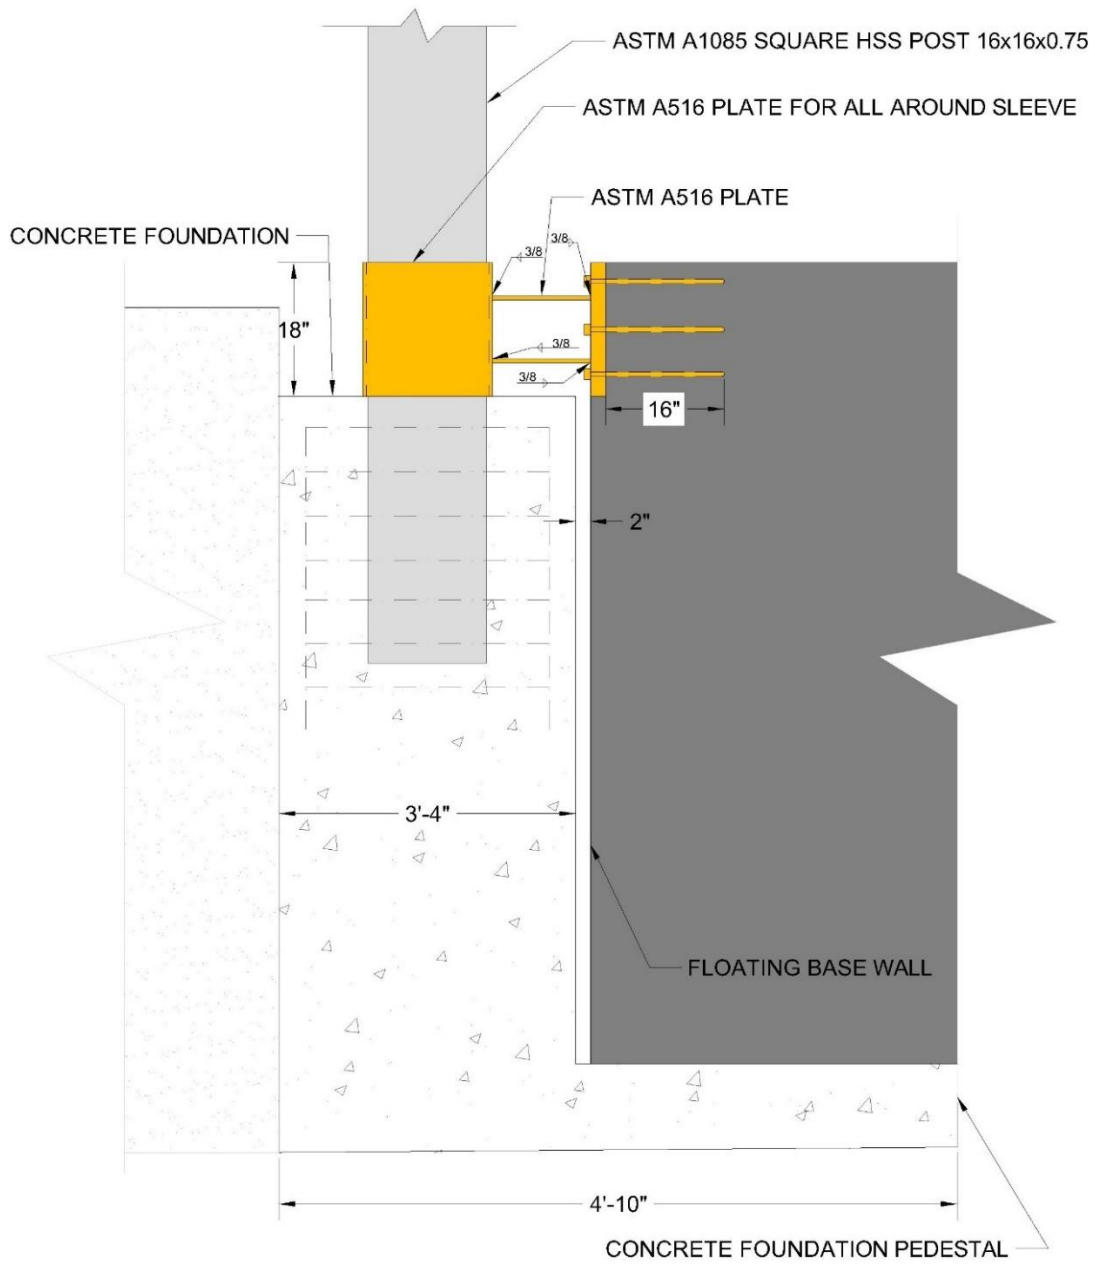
Side view of the base-post connection as well as the post-foundation connection
